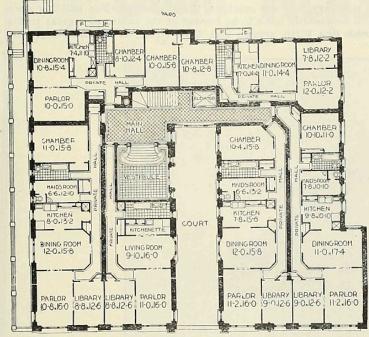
FLOOR PLAN, SHOWING SUITE ARRANGEMENT IN DACONA HALL.
